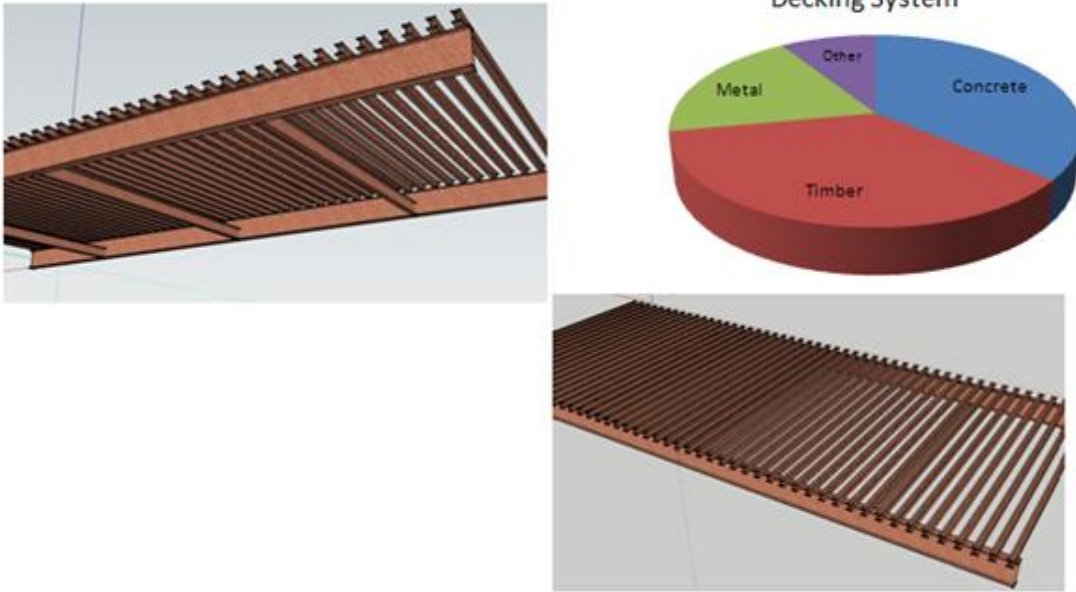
Two-girder Bridge Type 4, 11 Bridges, 3%
